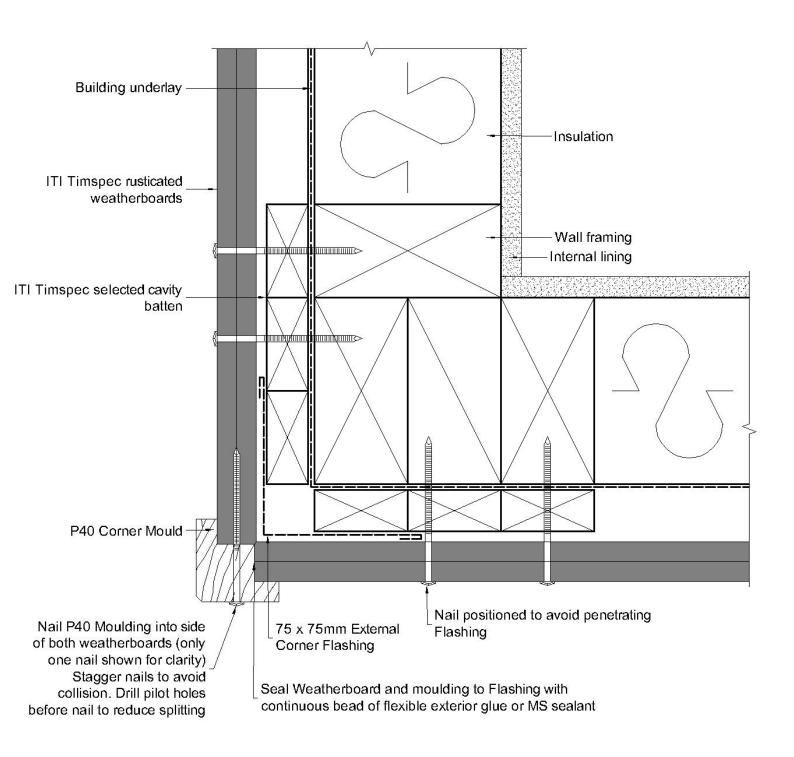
12 RC 404 EXTERNAL CORNER – P42 CORNER MOULDING
